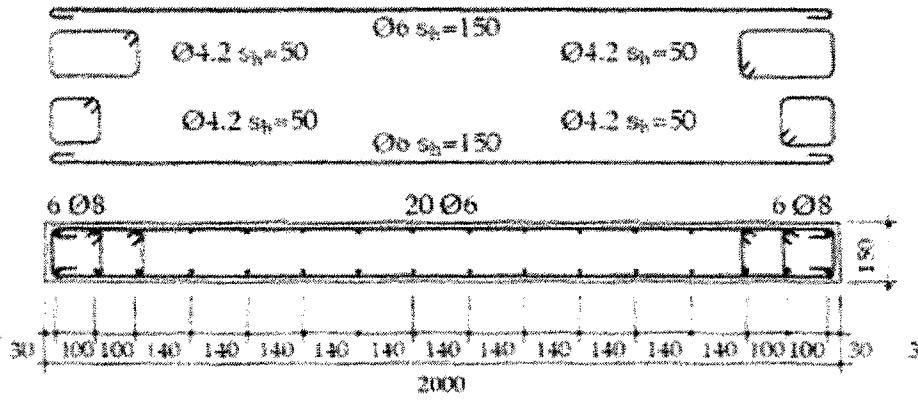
Reinforcement details of WSH5 (after Dazio et al., 1999)
